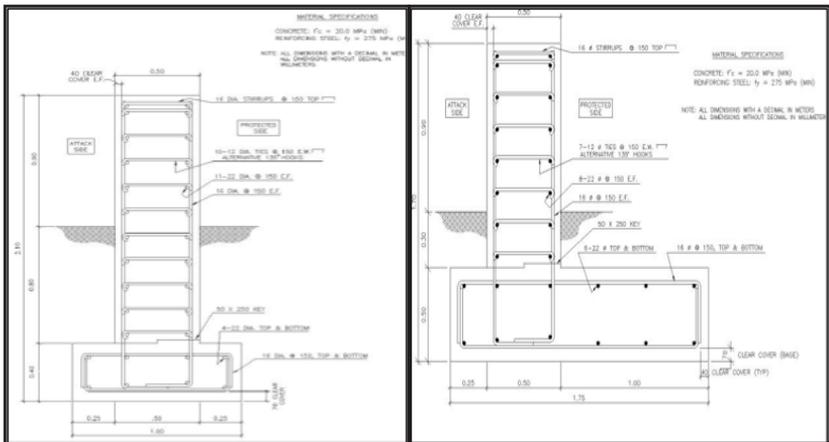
Anti-Ramming Walls. Left: Foundation wall; Right: Knee wall. (UFC 4-022-02)
